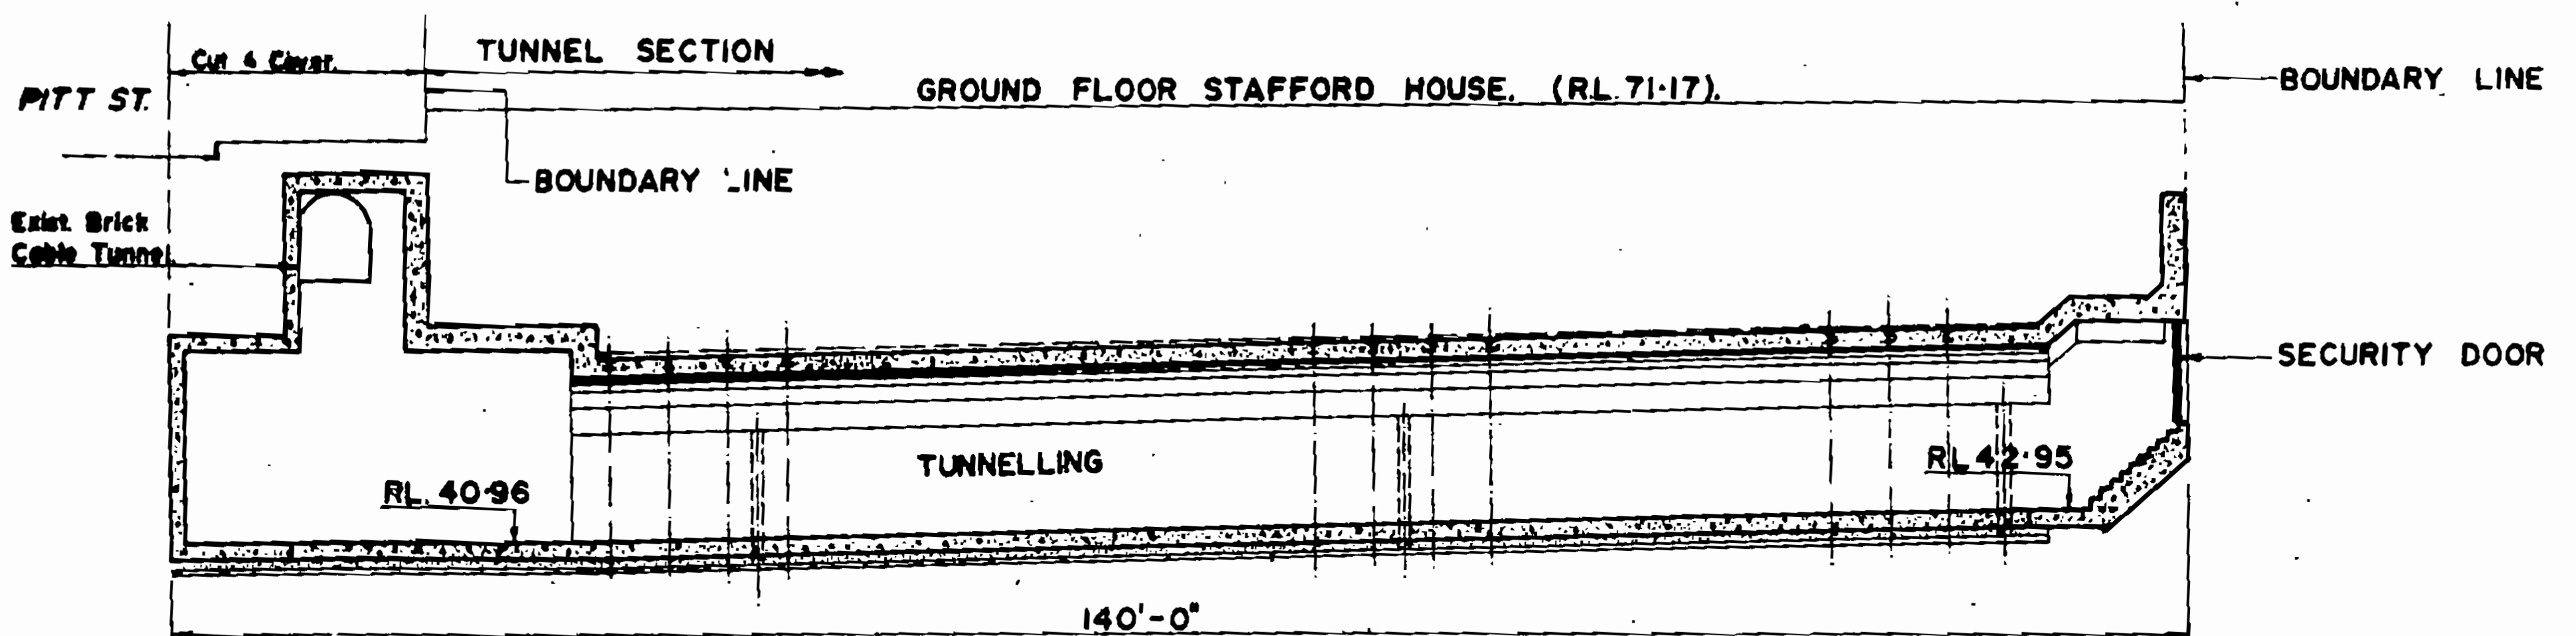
Longitudinal Section Pitt St. Tunnel.
